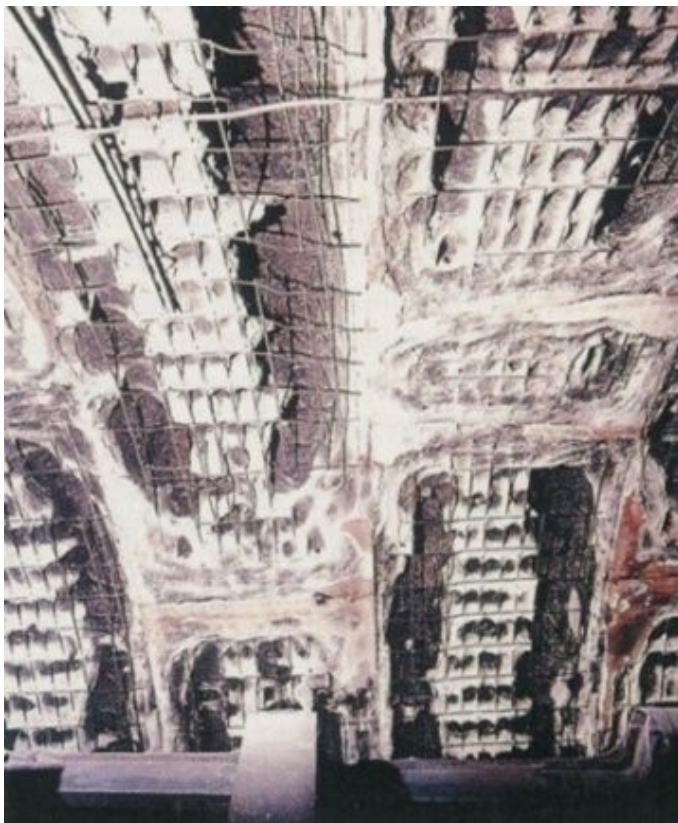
Spalling with exposed rebar after the Channel Tunnel fire [4]
